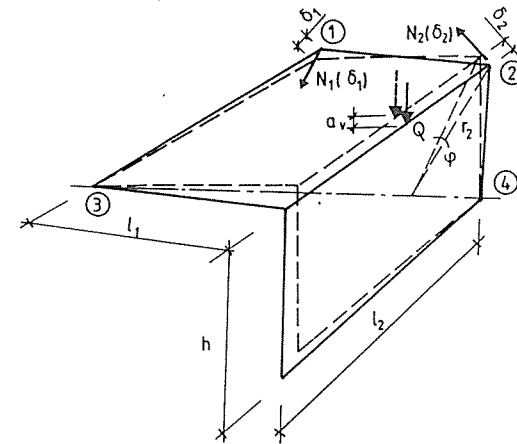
An alternative load-bearing system at the corner of a shear wall building after loss of the outermost support.
